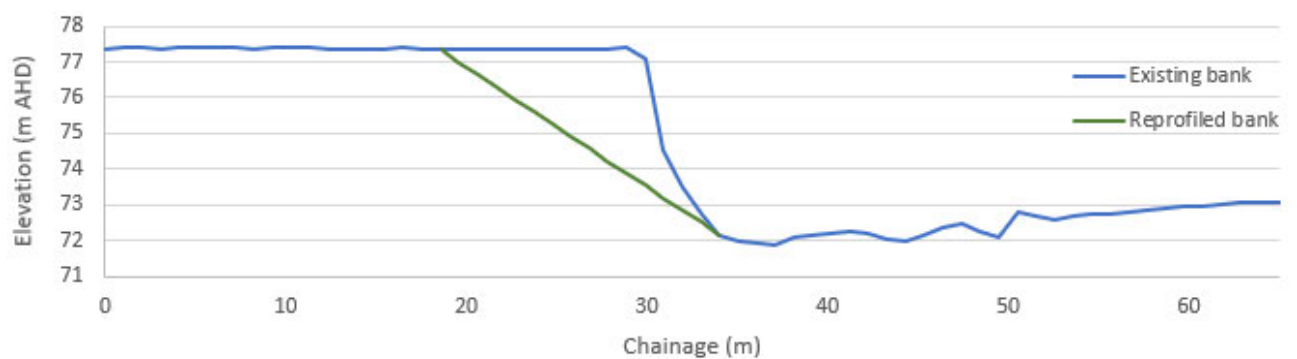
An example of a typical cross section of the bank reprofiling works required at Site B
